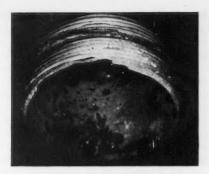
Steel pipe from treated circulat-ing water system in which cooling tower drew in exhaust air from above copper plating baths. Light areas of pipe interior are copper coated and dark areas are pitted.
